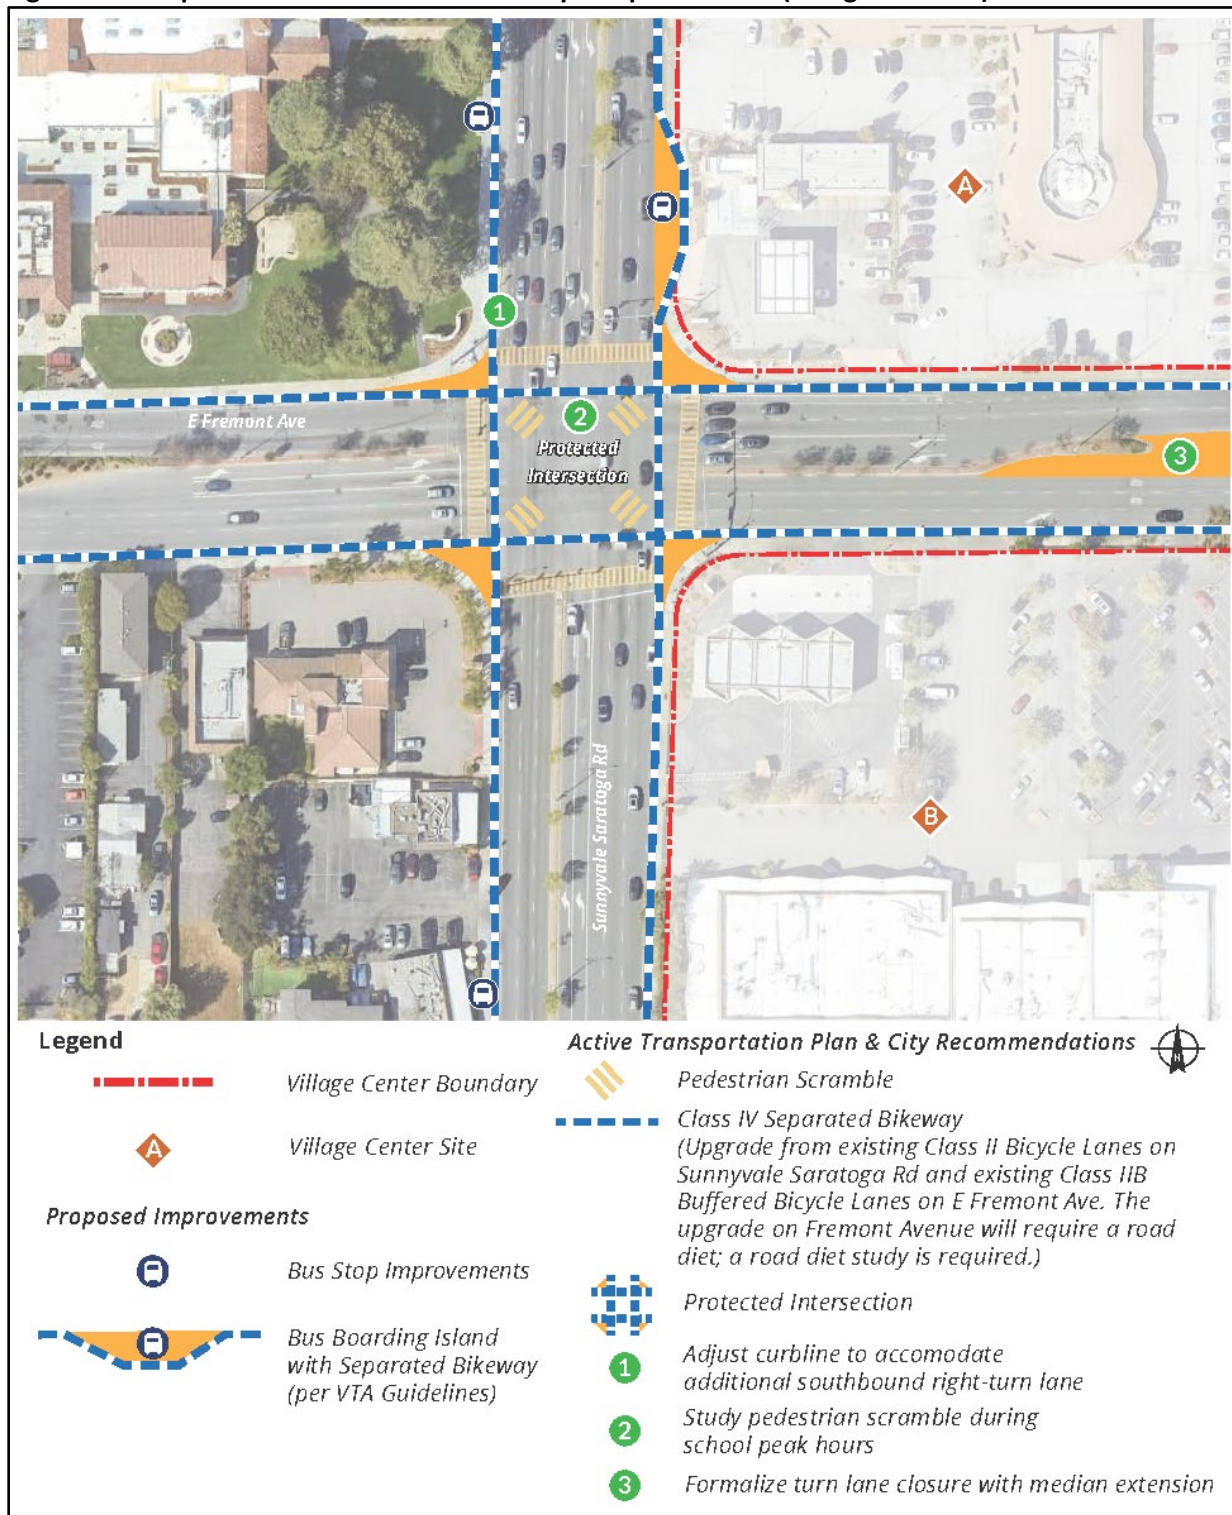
Required Circulation and Streetscape Improvements (Village Center 3)
